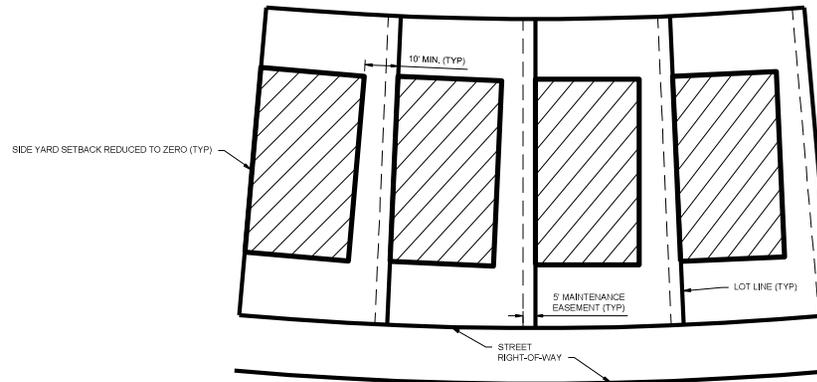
FIGURE A - TYPICAL "TYPE A" LOT CONFIGURATION
